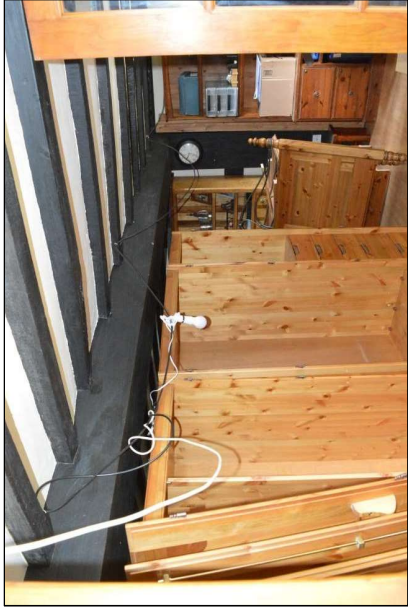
False beam masking the steel girder in the living room (CPAT 4900-0027)
